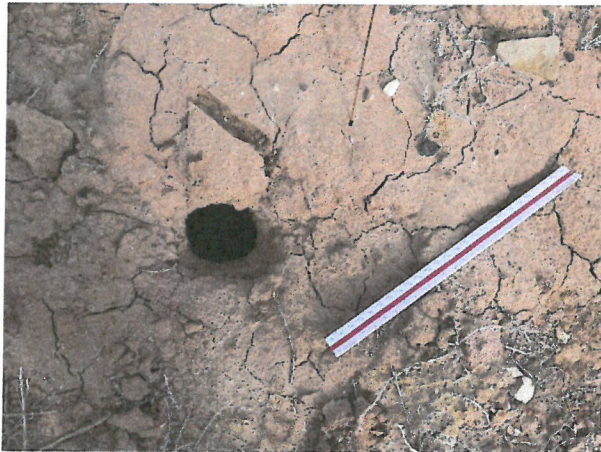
A3-2 – T-7 location: Looking southeast into trench. An open crack can be observed in southeast wall.
